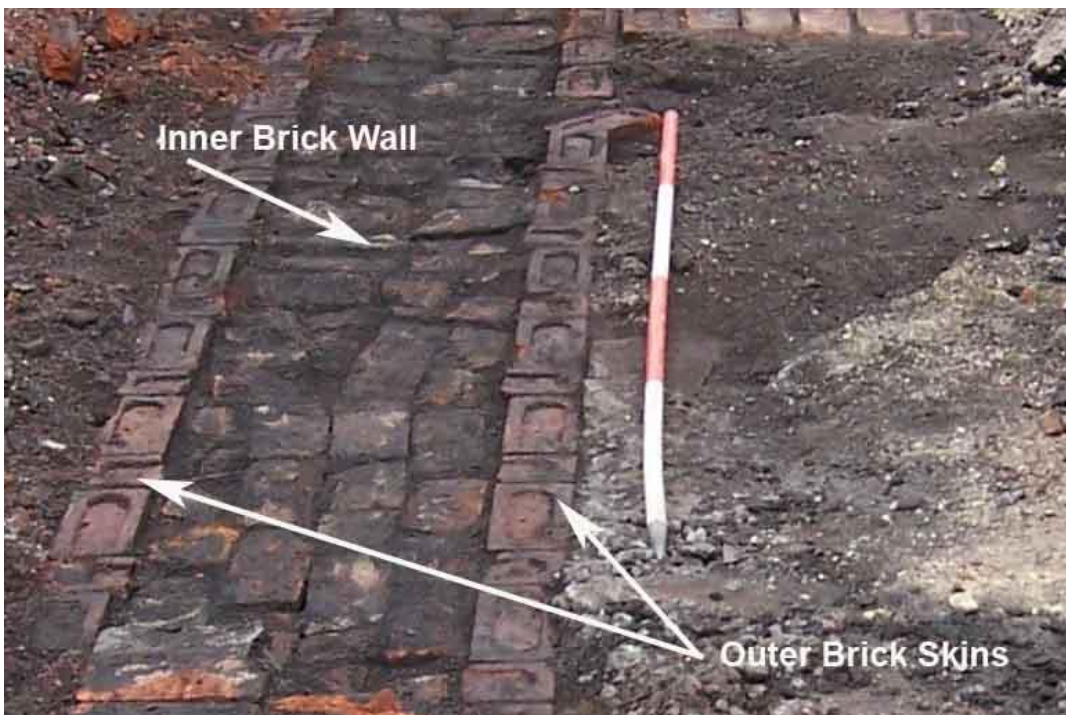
Facing N showing a close up of the inner and outer brickwork of the market hall's western wall.
